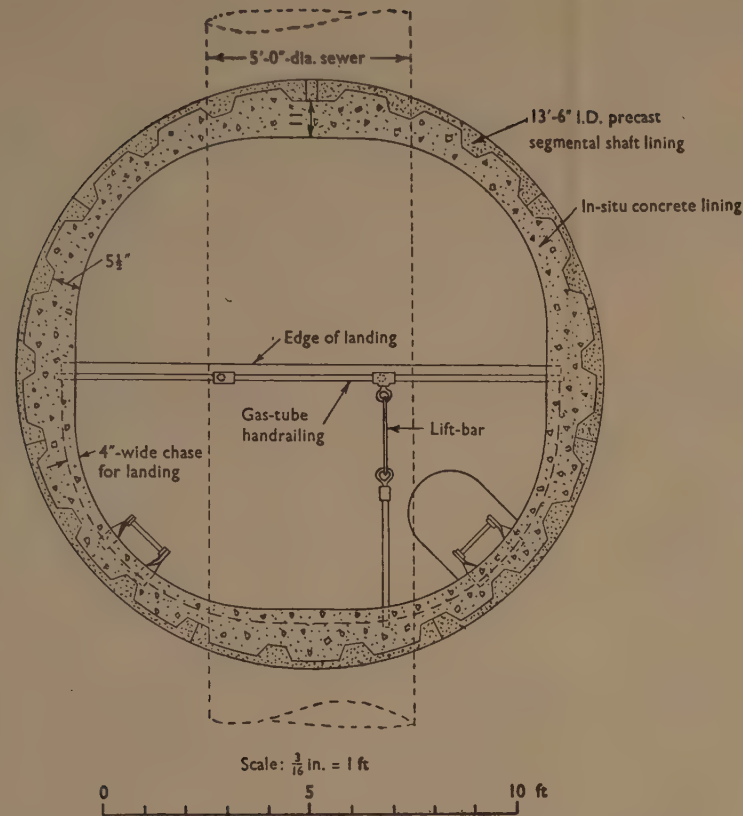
SECTION THROUGH MANHOLE 2 SHAFT SHOWING LINING AND TYPICAL LANDING DETAIL
